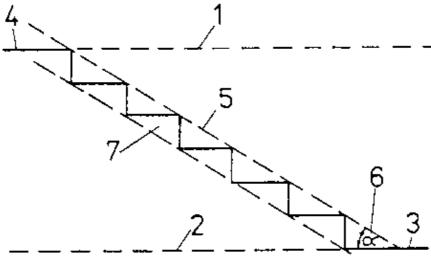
Features of a staircase (set of steps) 1 upper level, 2 lower level, 3 surface – bottom landing, 4 surface – top landing, 5 stair flight line, 6 angle of inclination of the stair flight, 7 stair flight (inclined pan of the stairs)
